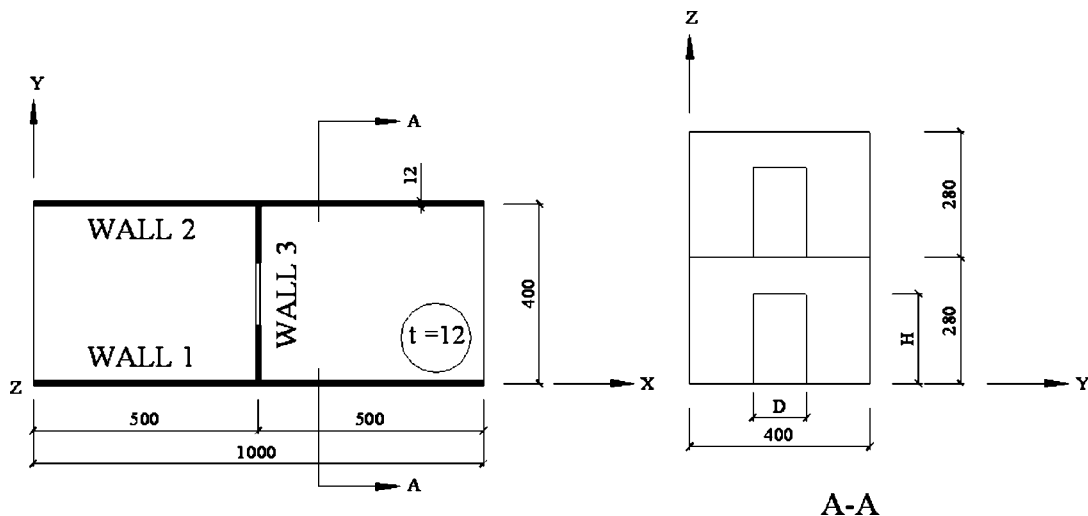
Typical plan and section view for slab-wall interaction model (units are in cm)
